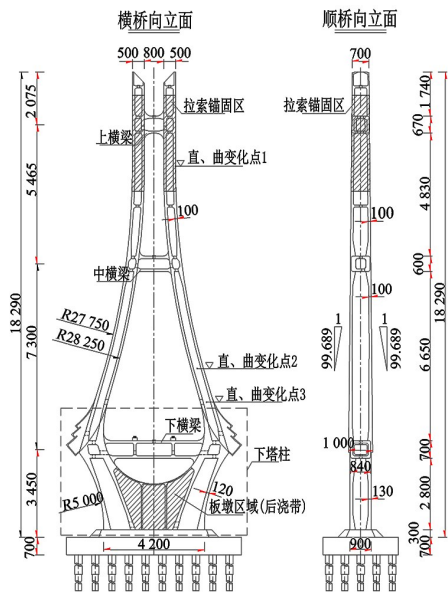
Layout and cross section of the Niutianyang main bridge (unit:cm)
